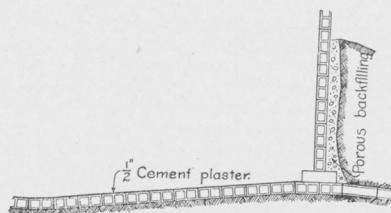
Number One Type of Foundation. Constructed entirely of Building Blocks.
